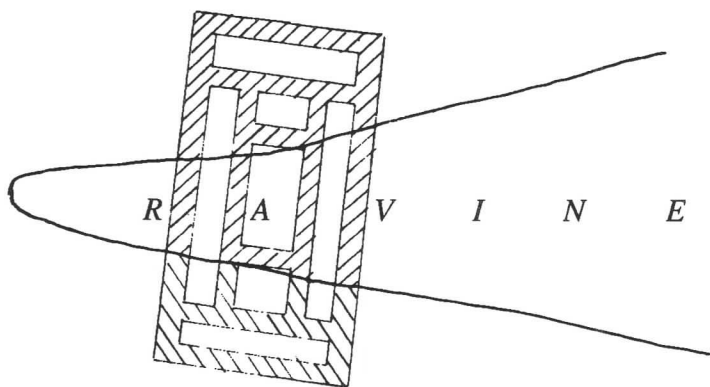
Plan of sandwich foundation under the temple of Apollo in Olbia
